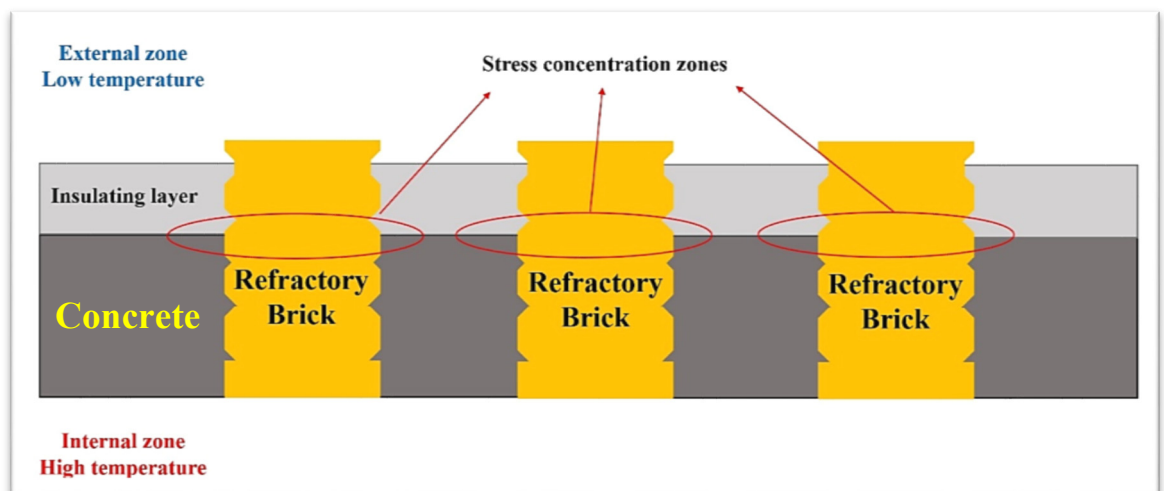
refractory wall section sketch. Red circles indicate the zone where a crack or a damage is expected to occur.
